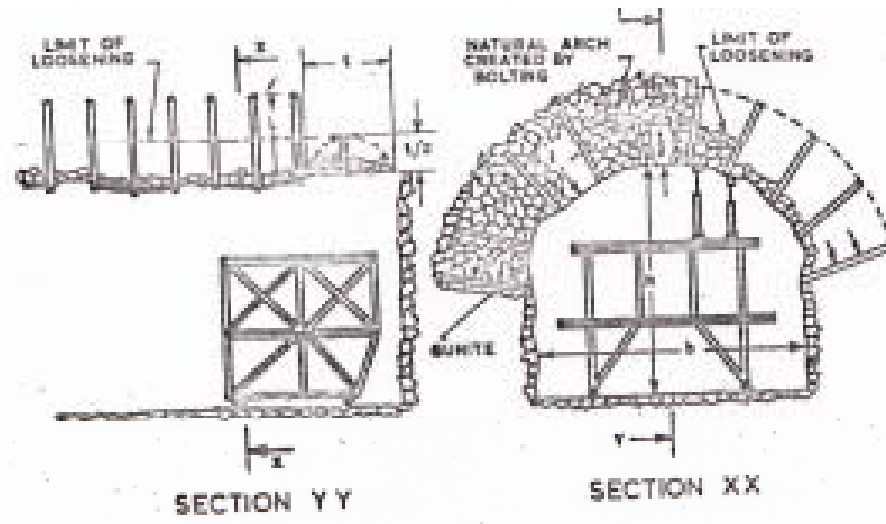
DIAGRAMMATIC SECTIONS DEMONSTRATING PRINCIPLES OF ROOF BOLTING
